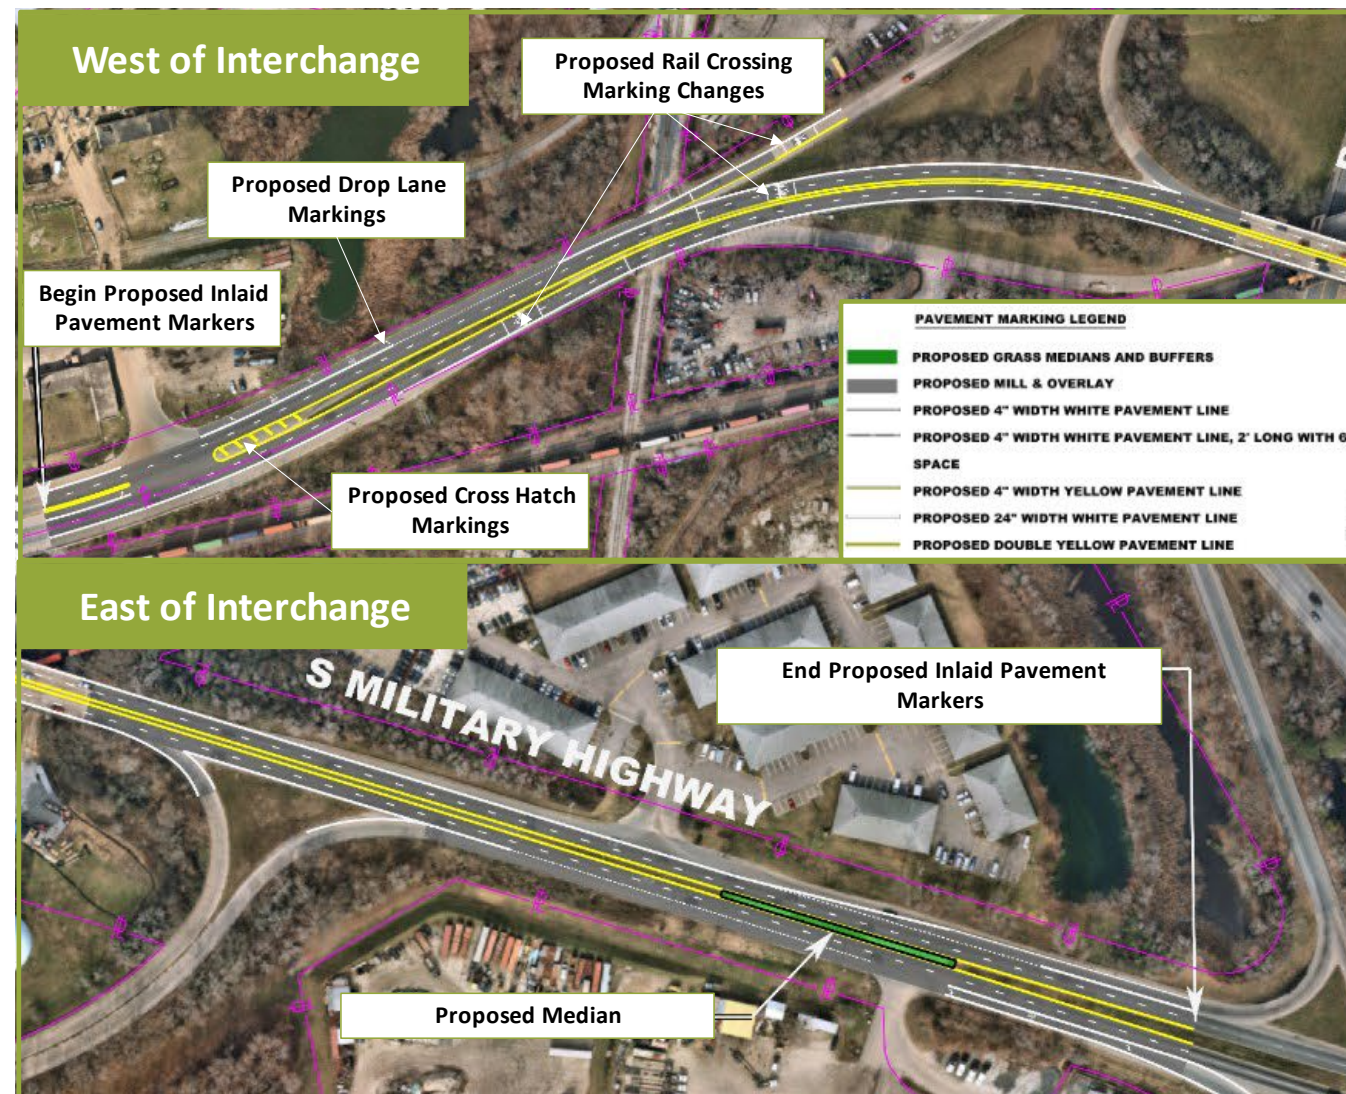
Phase 2 Concept - Pavement Marking Improvements Along Bainbridge Boulevard
